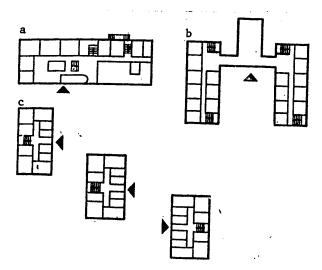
Space and floor-planning layout of schoolbuildings. a--Centralized; b--blocked; c--pavilion.
